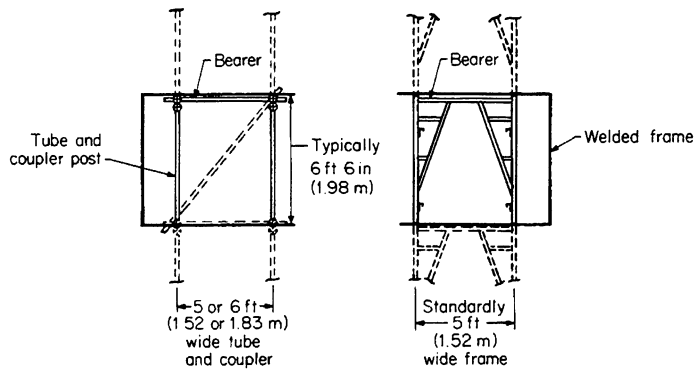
Cross Section through Tube-and Coupler and Frame-Type Shoring
